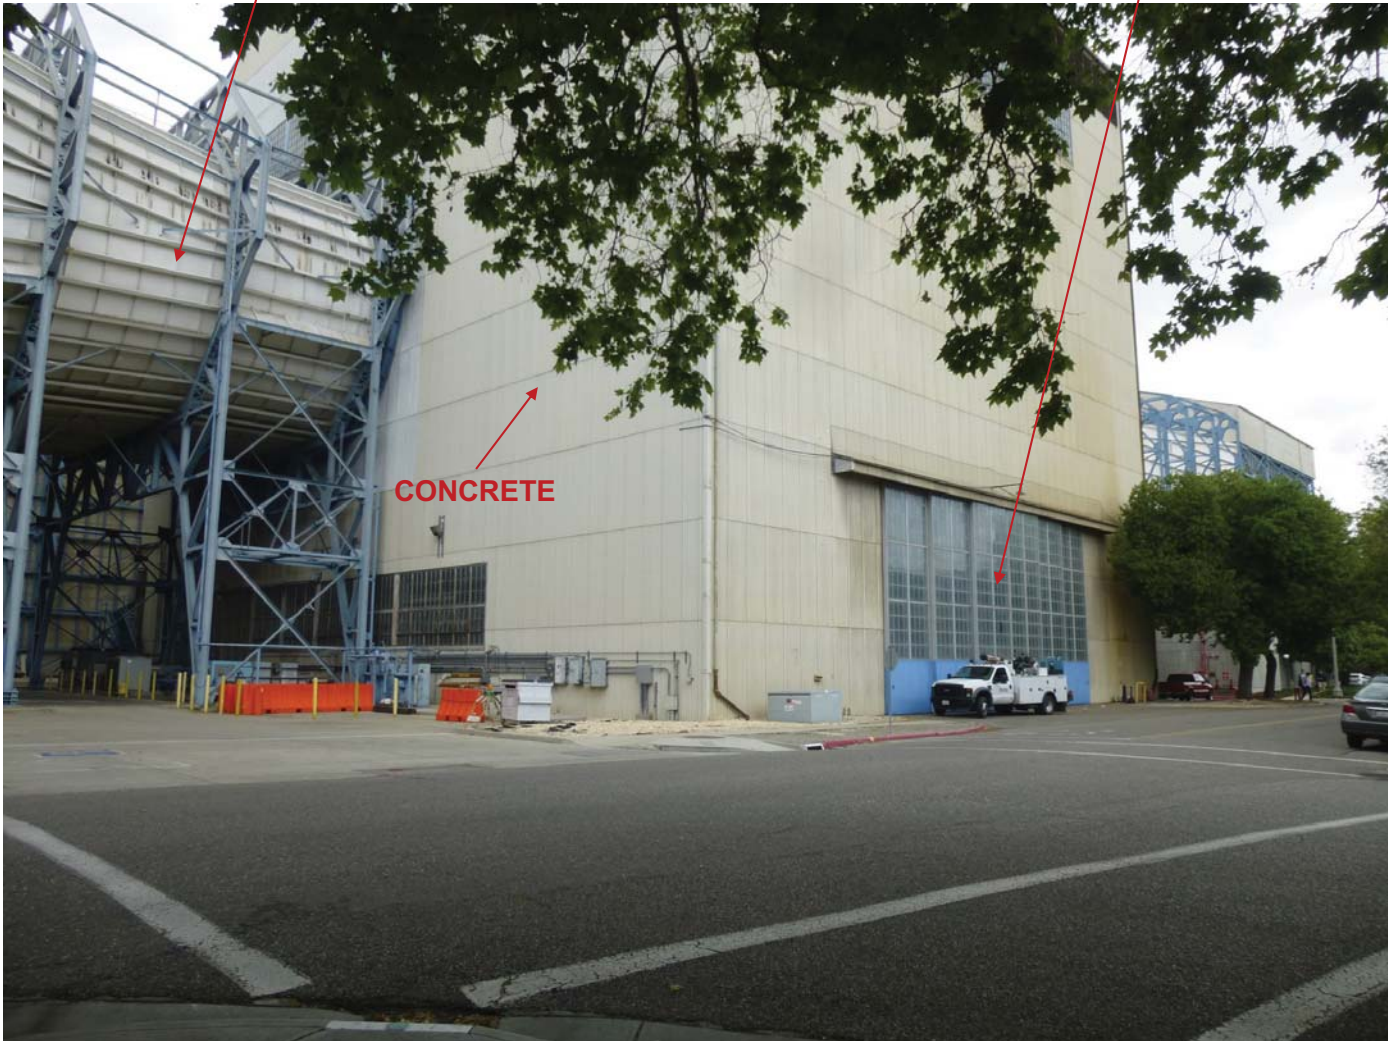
Building N221, side adjacent to the project site (view facing northwest).
